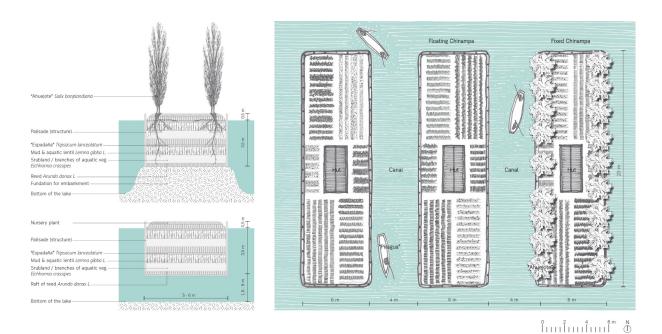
Detail plan and section of Chinampas Water System. Copyright 2021 by author
